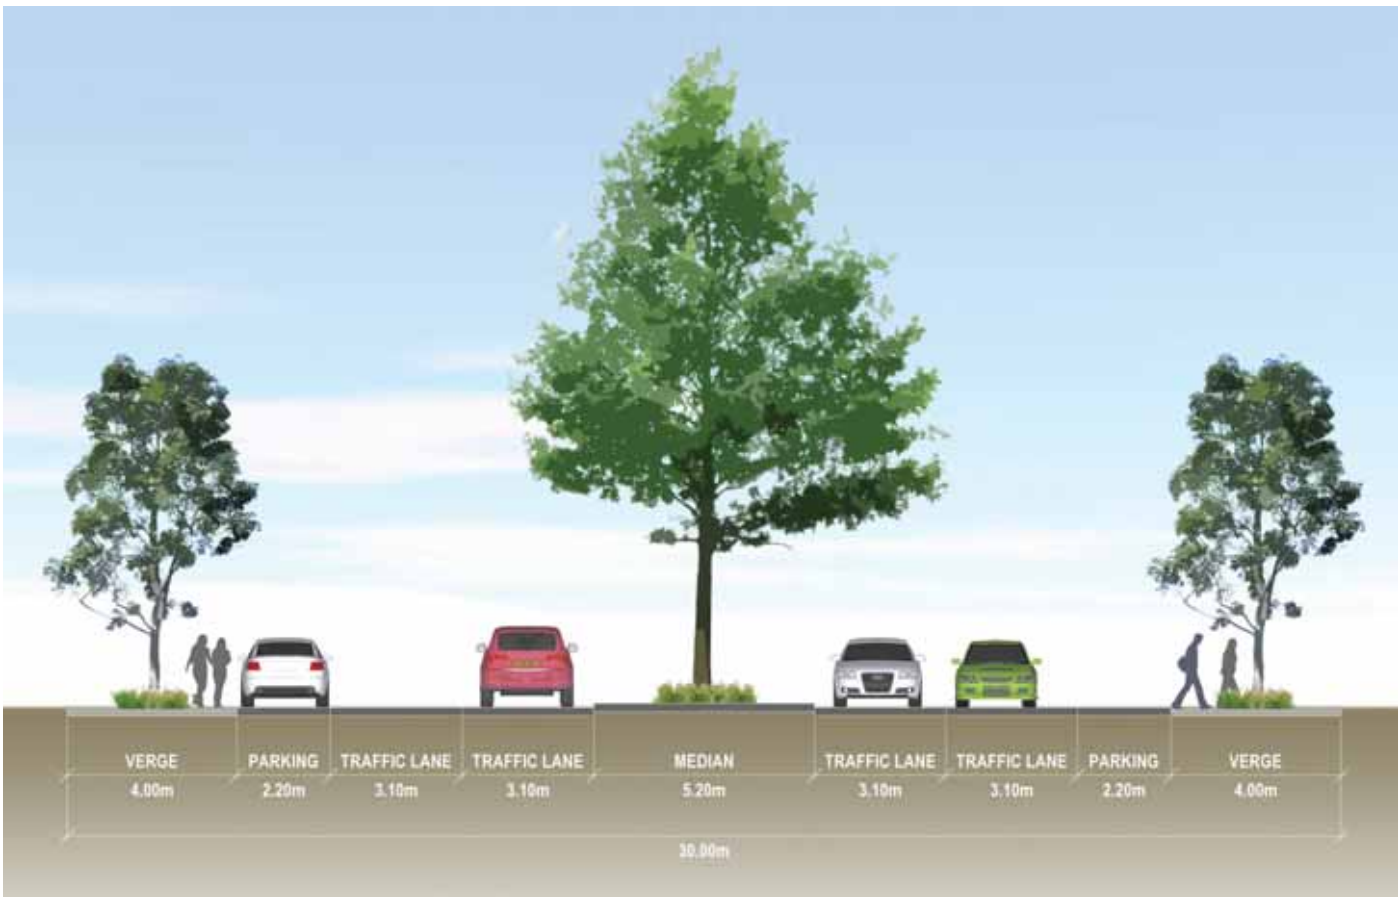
Cedric Street Conceptual Cross Section (between Ellen Stirling Boulevard and Freeway)
